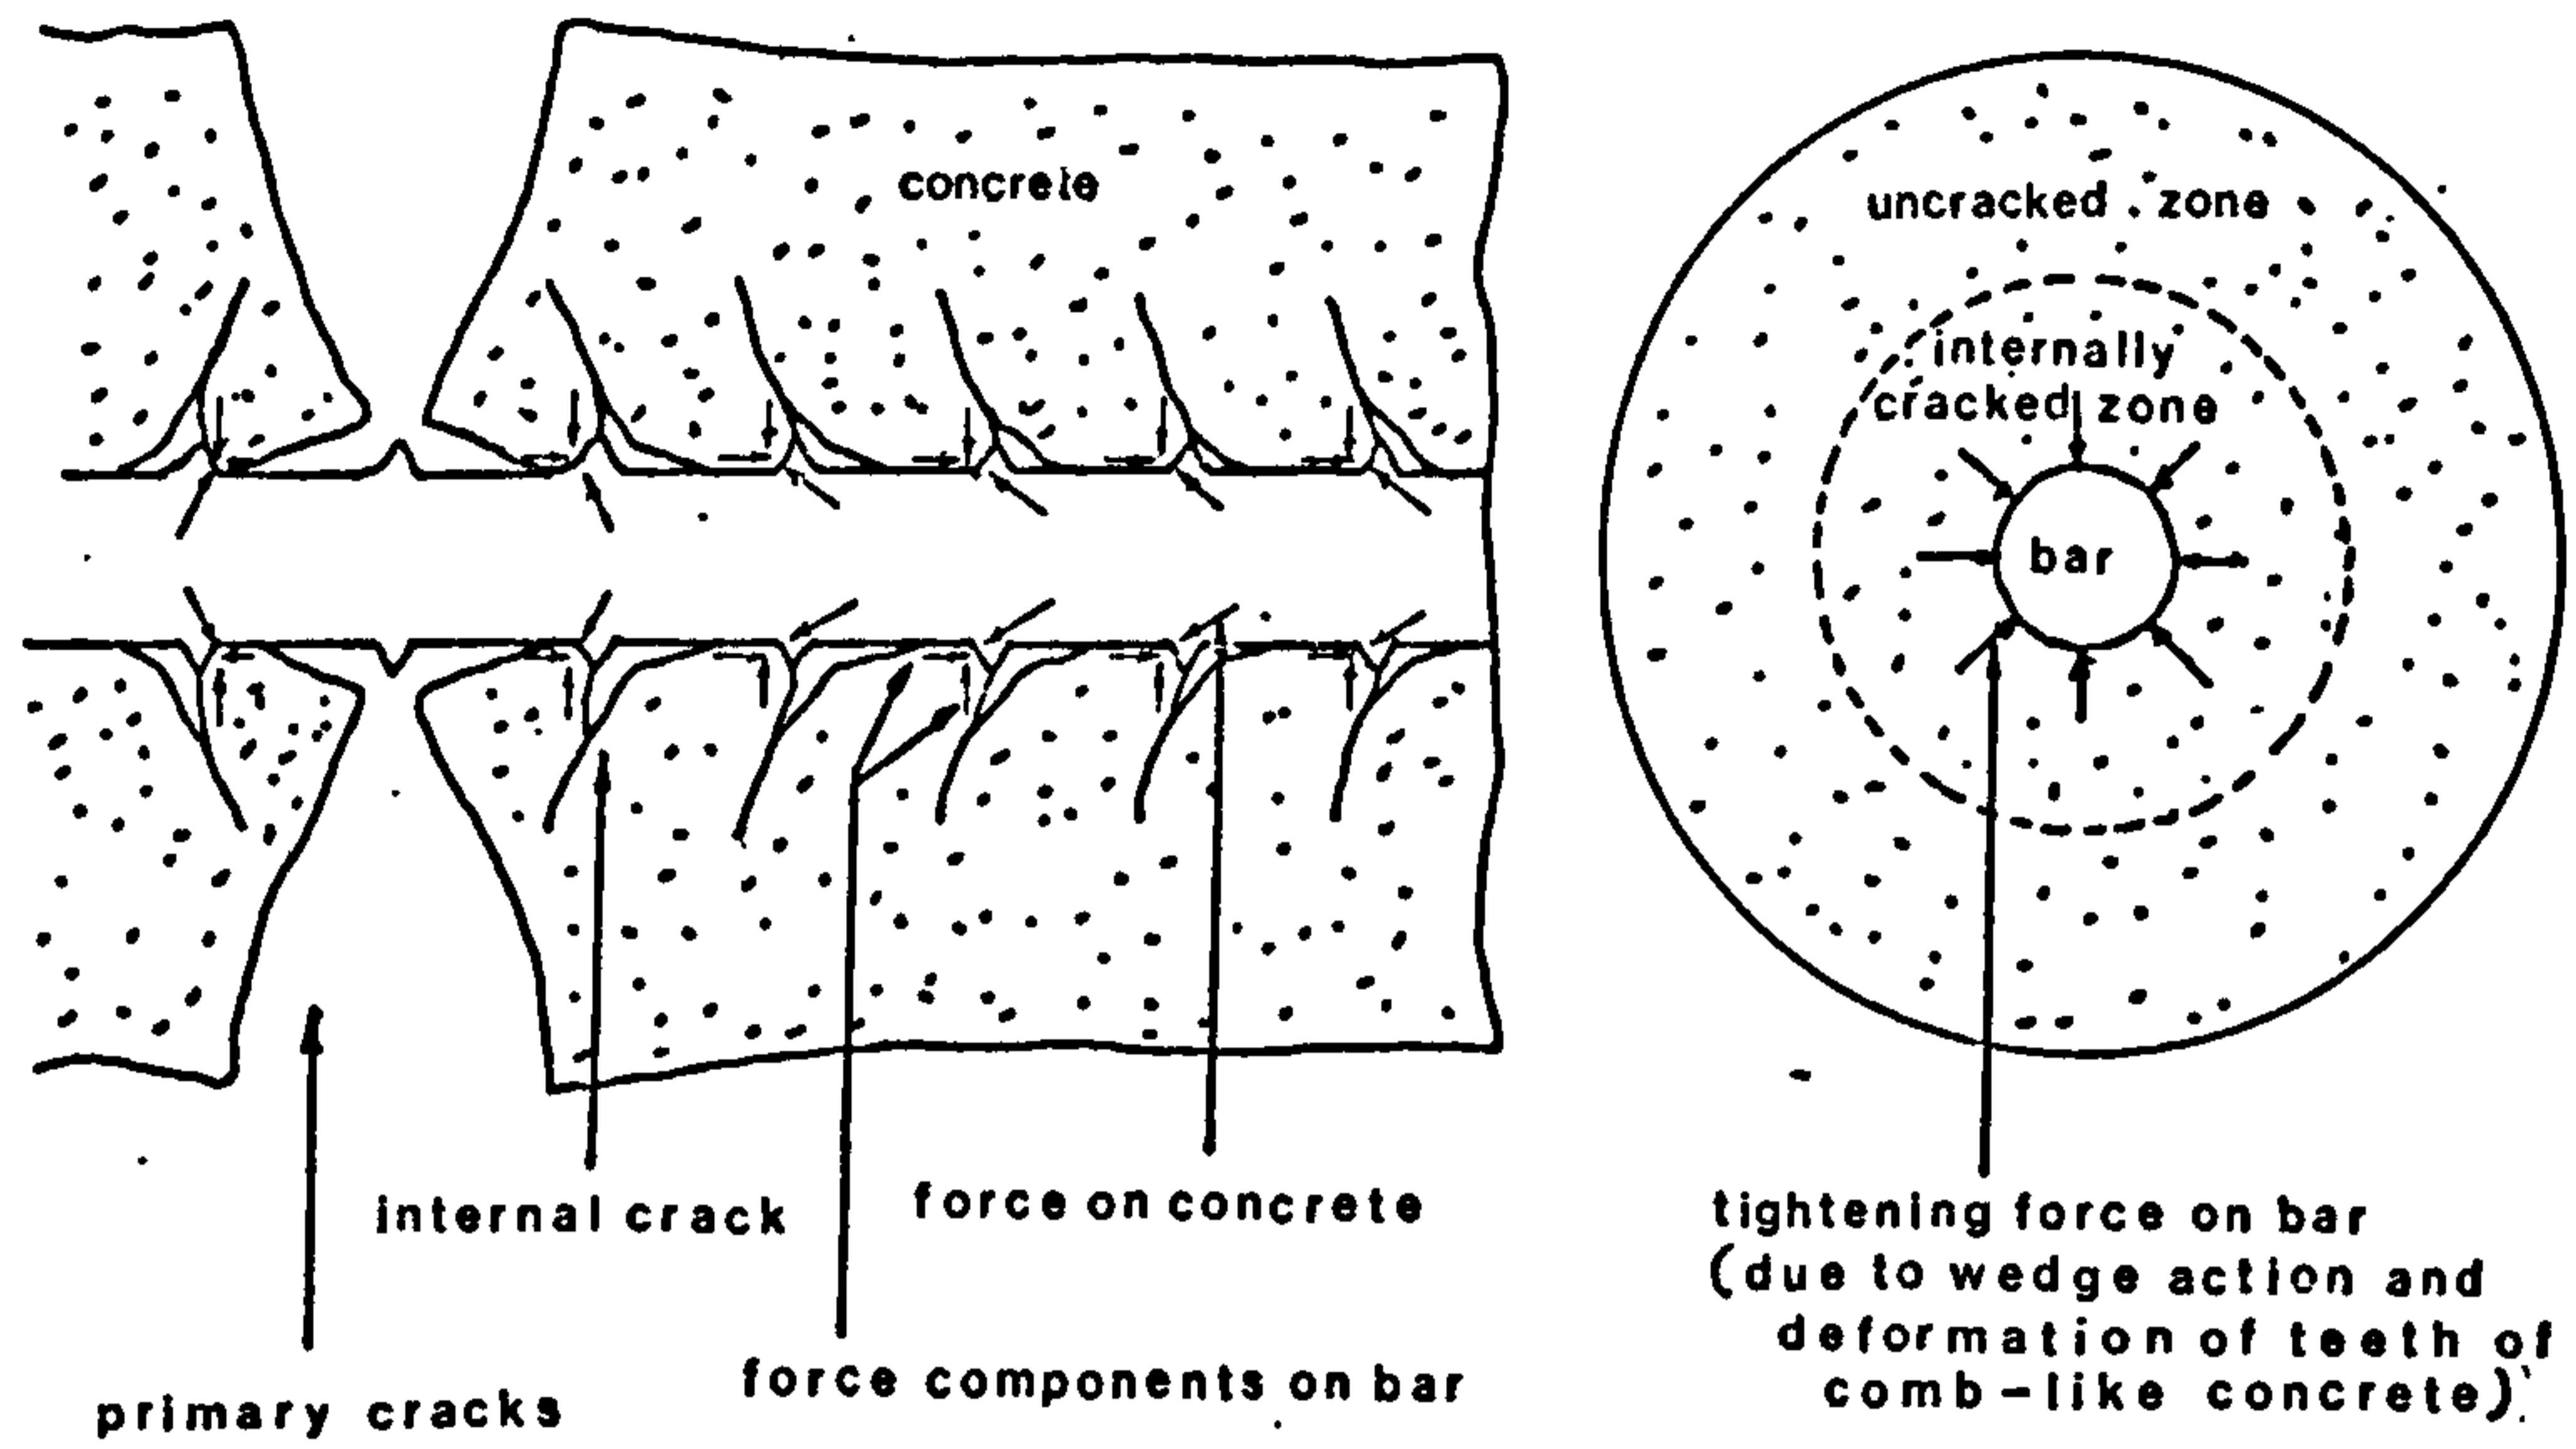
Deformation of Concrete Around Reinforcing Steel After Formation of Internal Cracks (after Goto (74))
